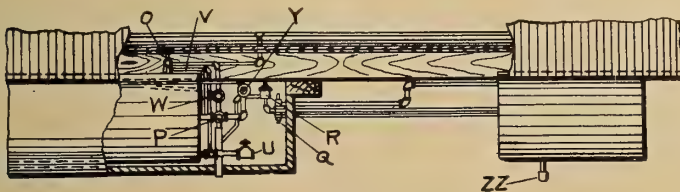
PART SECTIONAL ELEVATION SHOWING CONNECTIONS AND PIPING BETWEEN AIR TANK AND WATER TANK.
